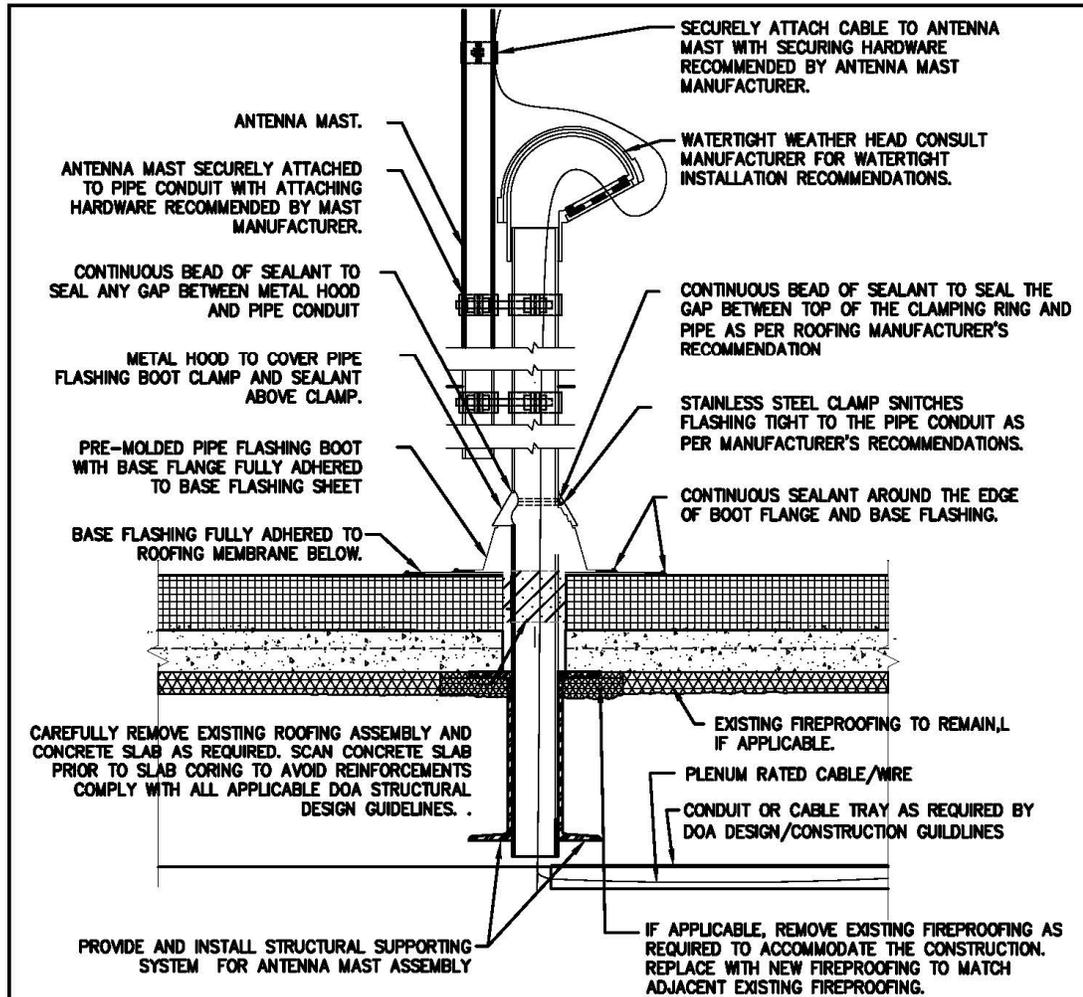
Pipe Thru Roofing System Over Conc. On Steel Deck
